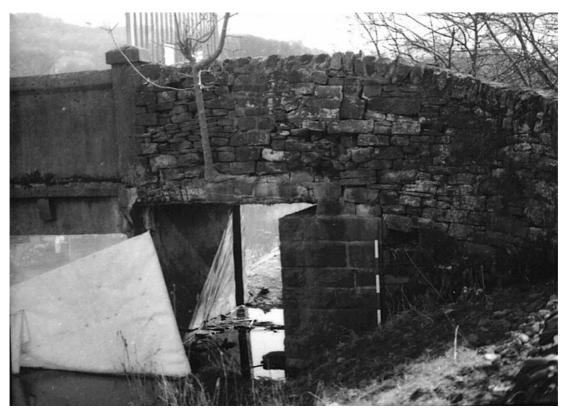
East-facing view showing southern trestle (4c) and western rubble wing wall (11a) (MF SB02_02)
